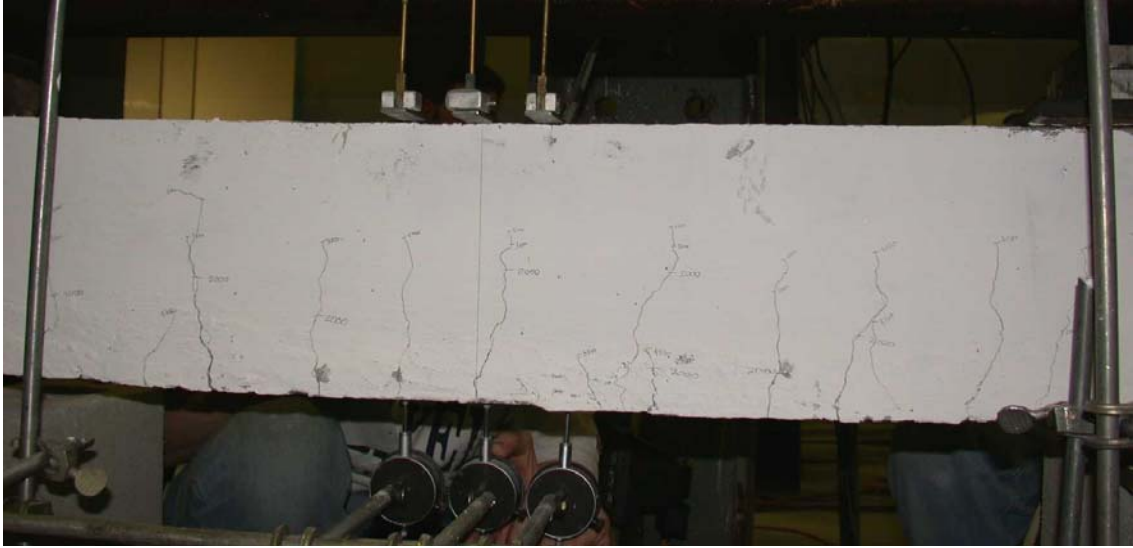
Cracking in Center of Span of Beam P-2 at Load Levels Up to 5200 lbs.
